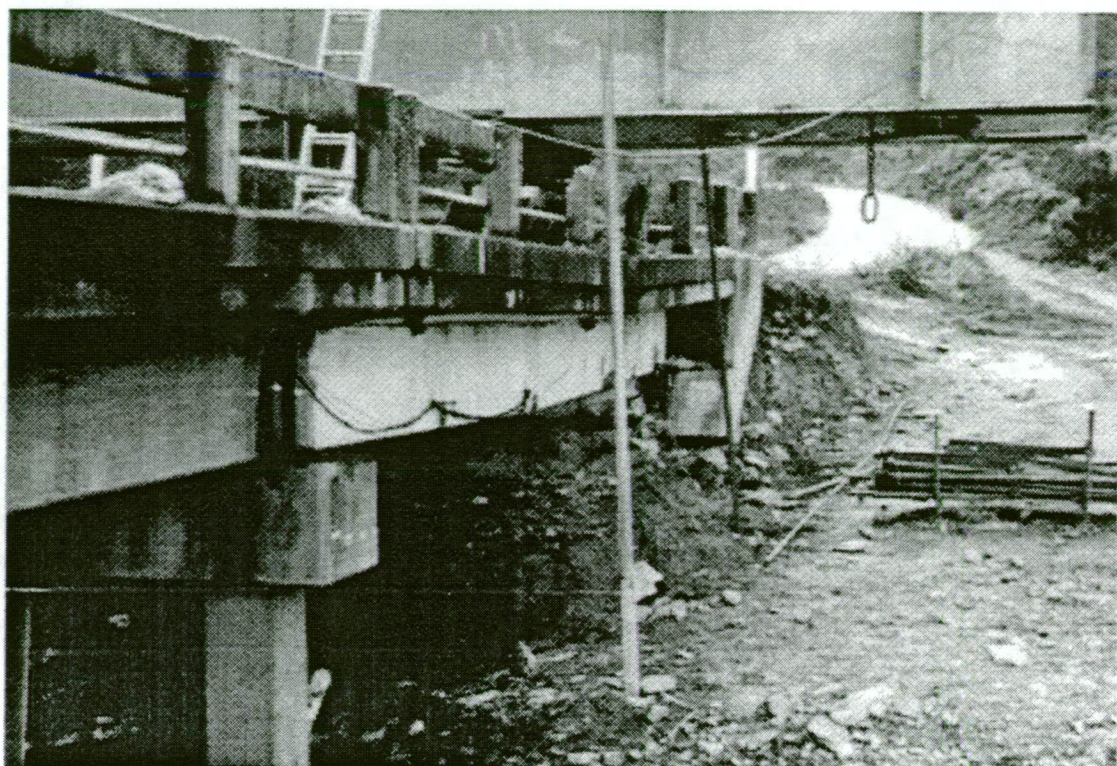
Upstream Side of Bridge at Ultimate Load
